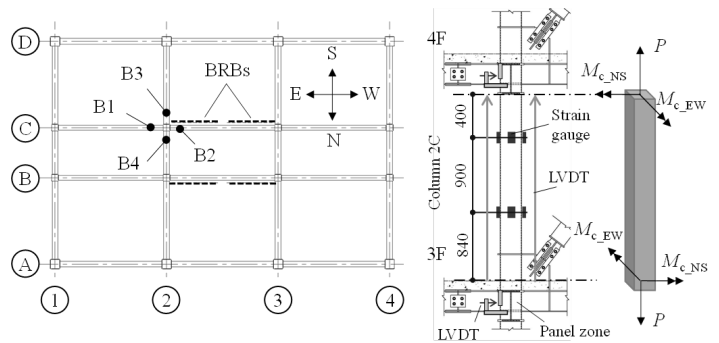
Instrumented panel zones, column, and beams (unit: mm)
